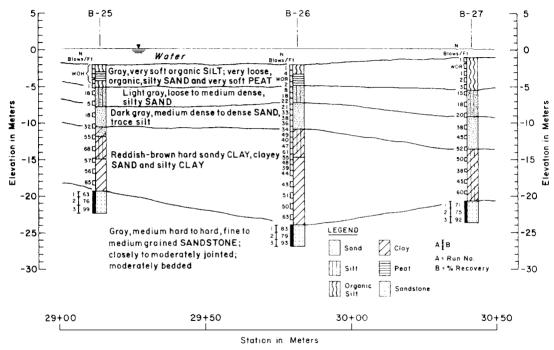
Subsoil profile. (From J. Lowe and P. F. Zaccheo, "Subsurface Explorations and Sampling," ch. 1 of "Foundation Engineering Handbook," ed. H. F. Winterkorn and H.-Y. Fang, Van Nostrand Reinhold Co., New York.)
